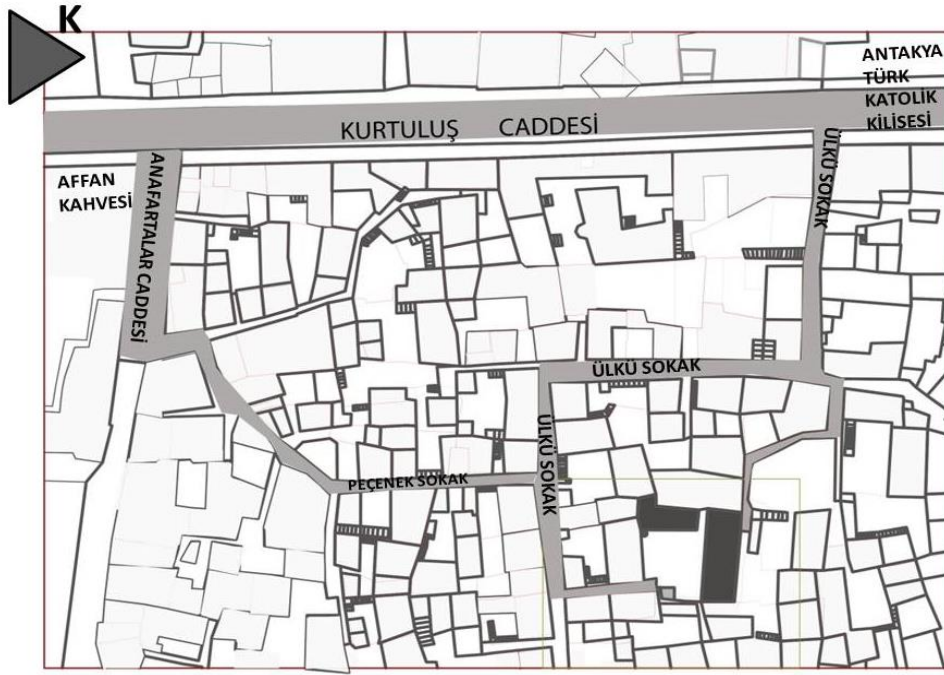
Beştetek House site plan and surroundings - District 3, Building lot 587 (METU CONS, 2019)
